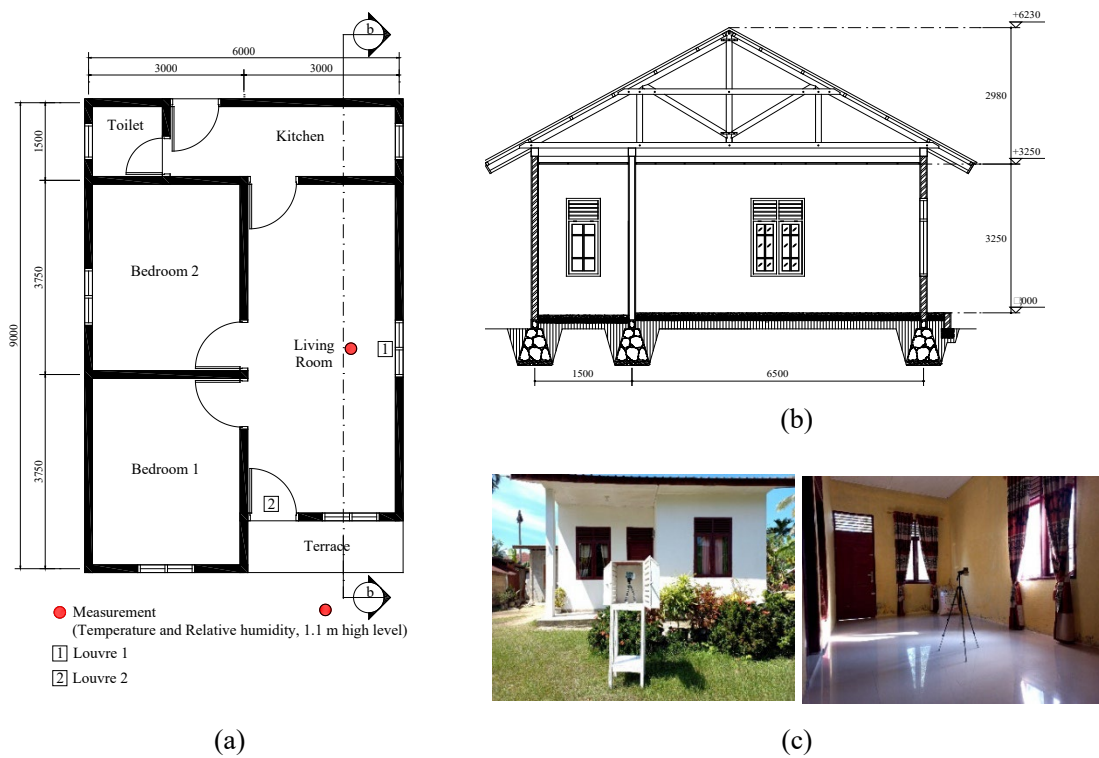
Plan and section of test house (unit: mm): (a) floor plan, (b) cross-section, and (c) measurement photograph
